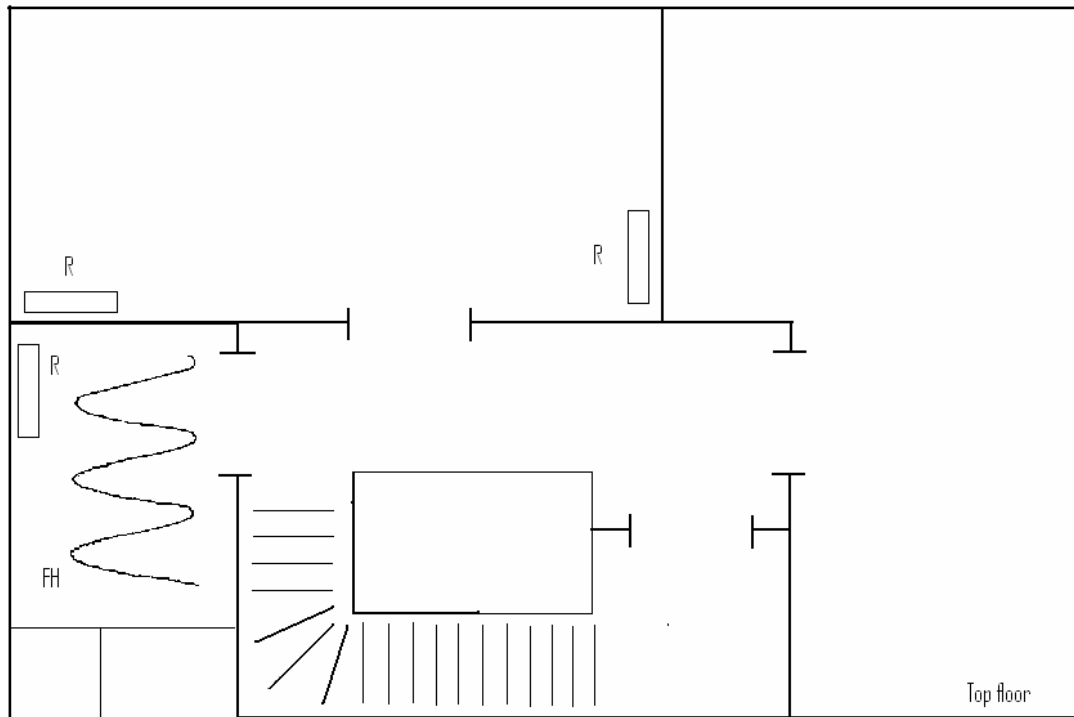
Second floor of the demonstration house (source: Carlqvist A.).
